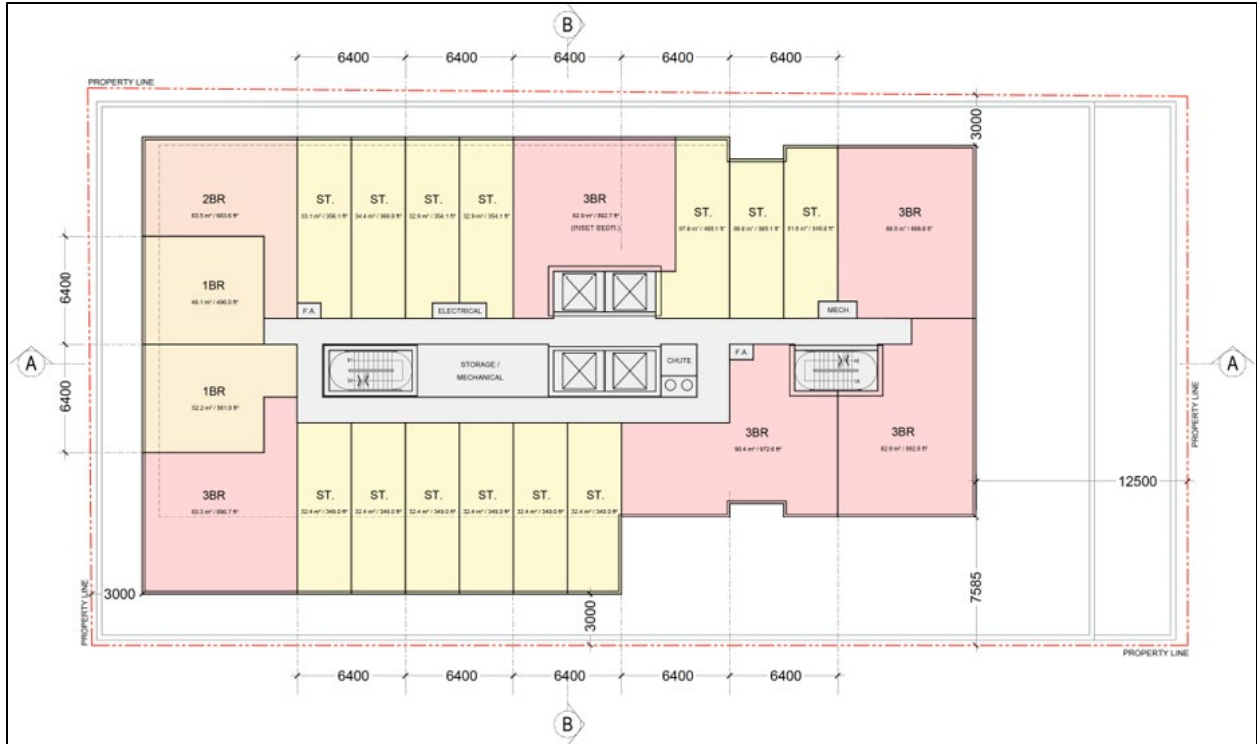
6th to 8th Floor Plan (Source: Hariri Pontarini Architects)
